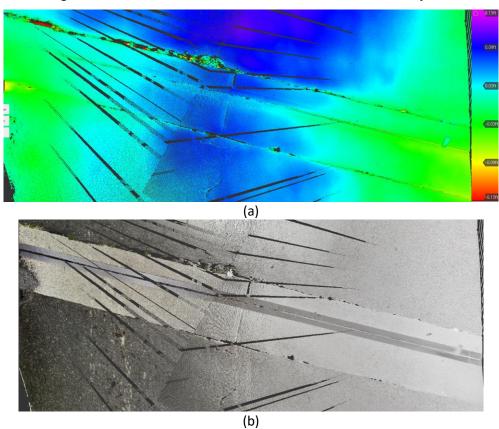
Structure 0954163 - West joint: (a) Elevation, (b) RGB.
